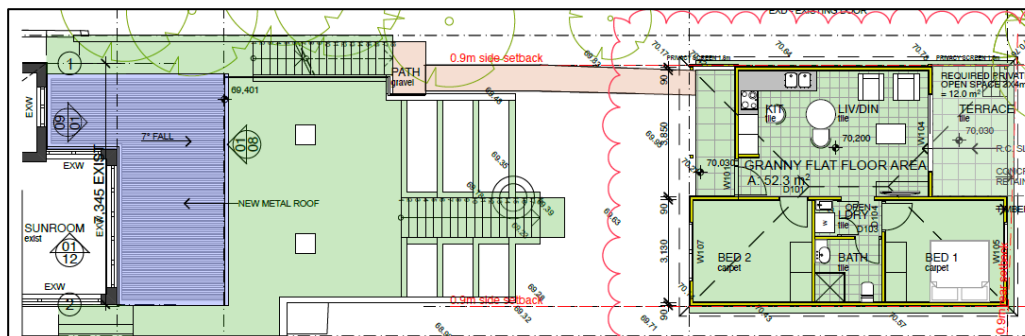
Proposed secondary dwelling ground floor plan (Source: Fortly & Grant Architecture Pty Ltd)
